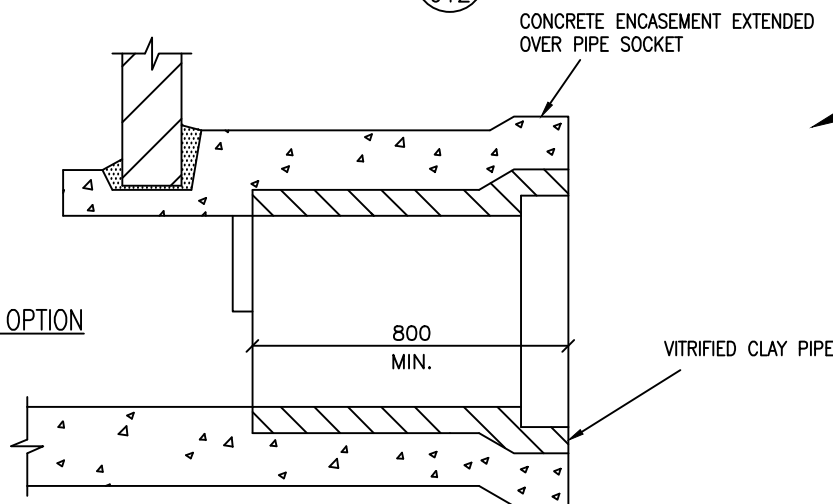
DETAIL OF PIPE CONNECTION FOR MANHOLES WITH BASE EXTENSION (TYPE A2)
